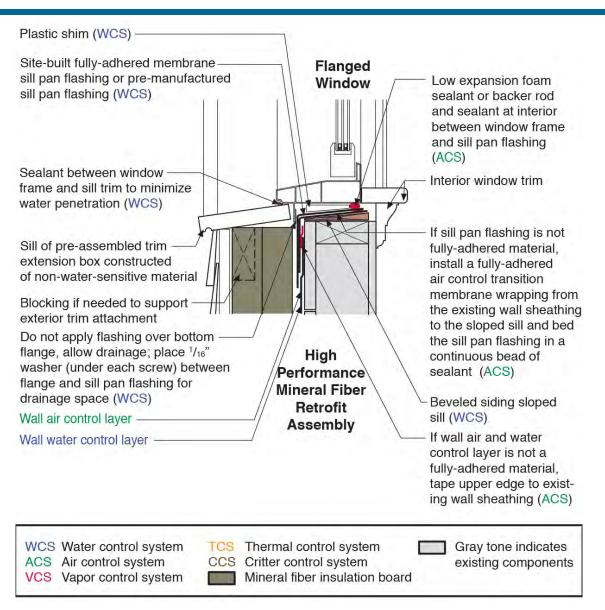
Schematic detail for window sill of new window or reinstalled window in a high performance mineral fiber retrofit wall assembly
